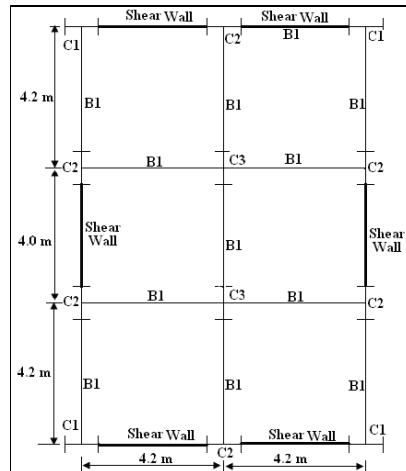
Plan of a G+6 storey building with steel plate shear walls
